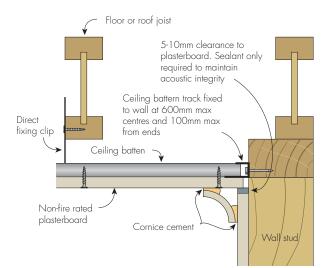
Ceiling to Wall Direct fixing clip and ceiling battern
